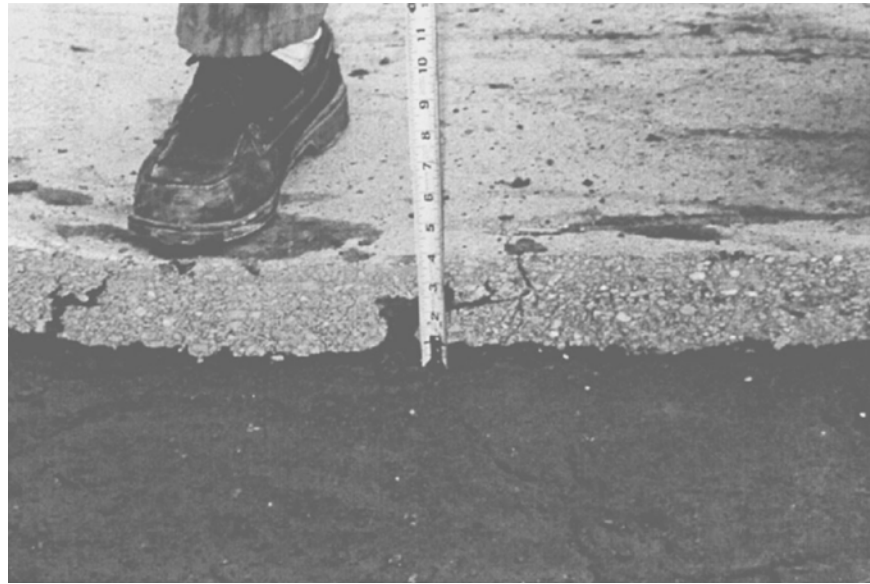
Cracking of Asphalt Pavement with CSL (Li et al. 1999)
